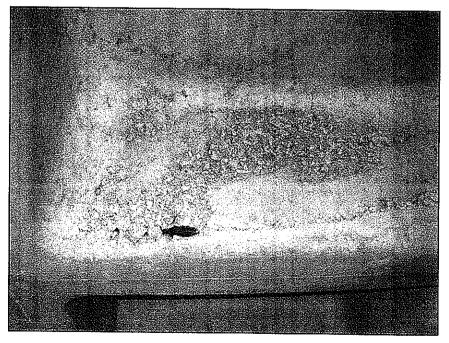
Concrete deterioration with rebar exposure at "rock pocket"
